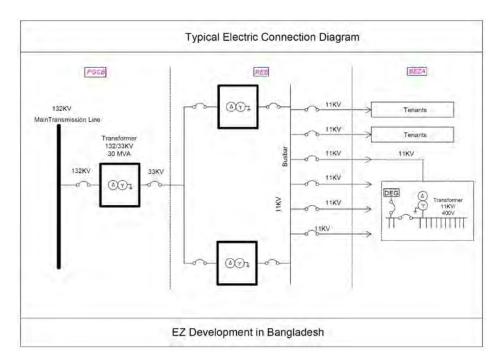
(4)-12 Outline of electric power reception/transformer plan for Araihazar
